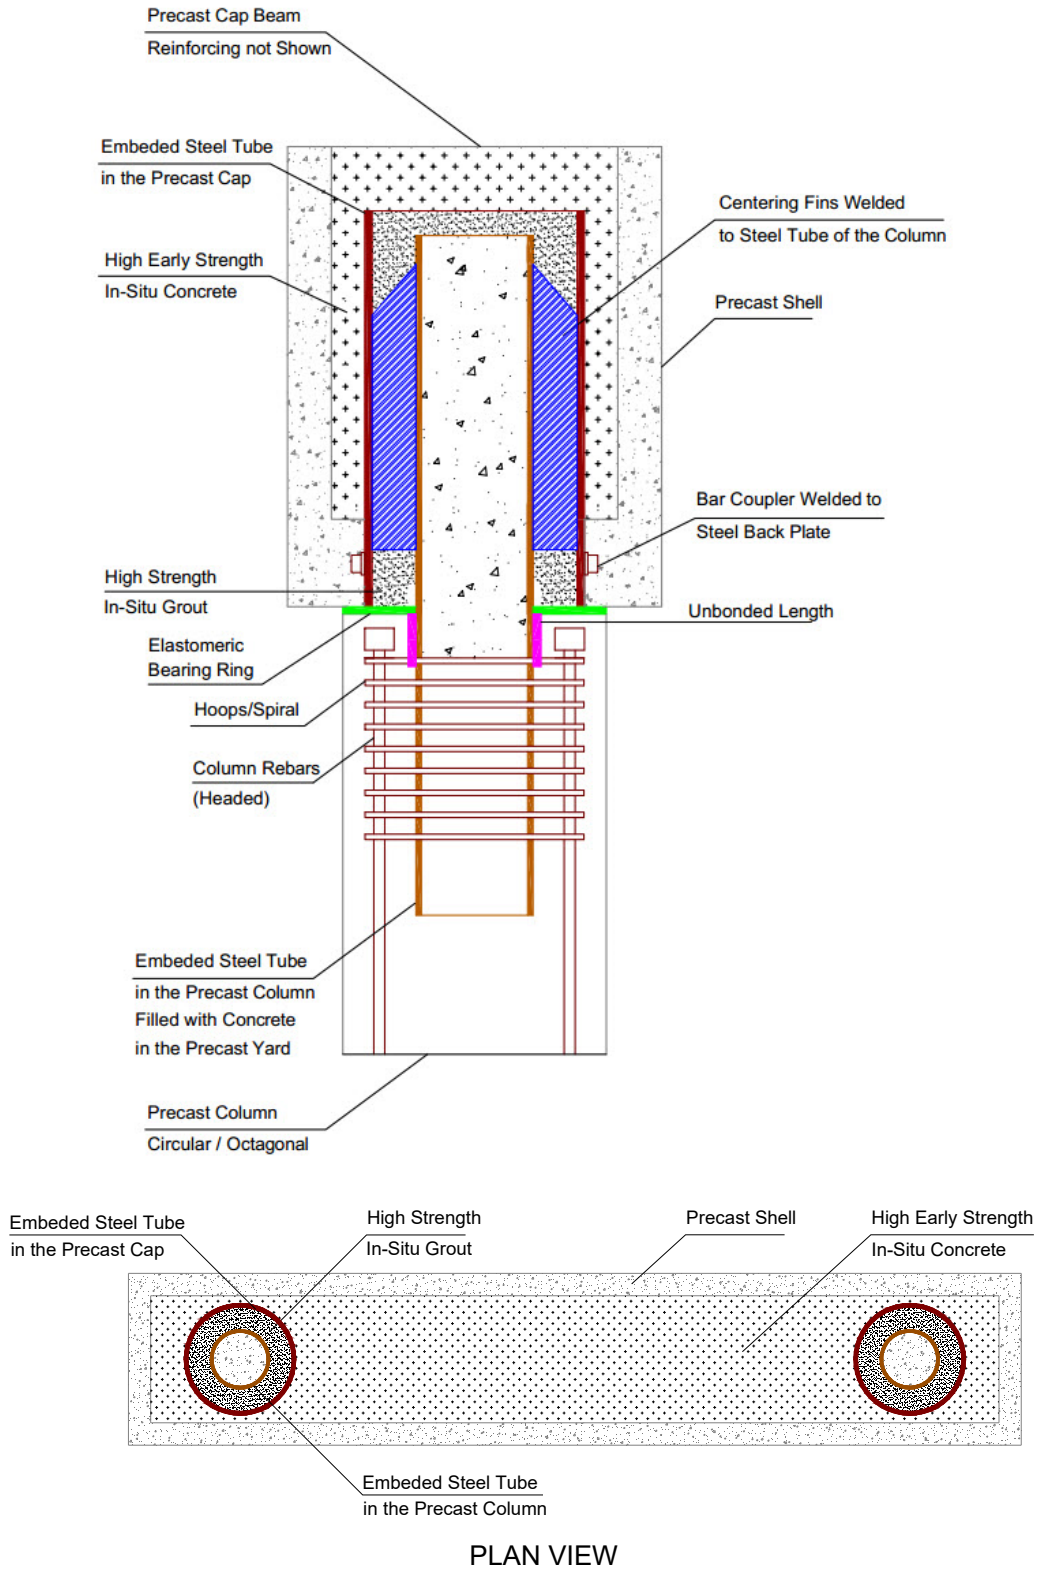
Column-to-Cap Beam Connection and Cap Details (NTS)
